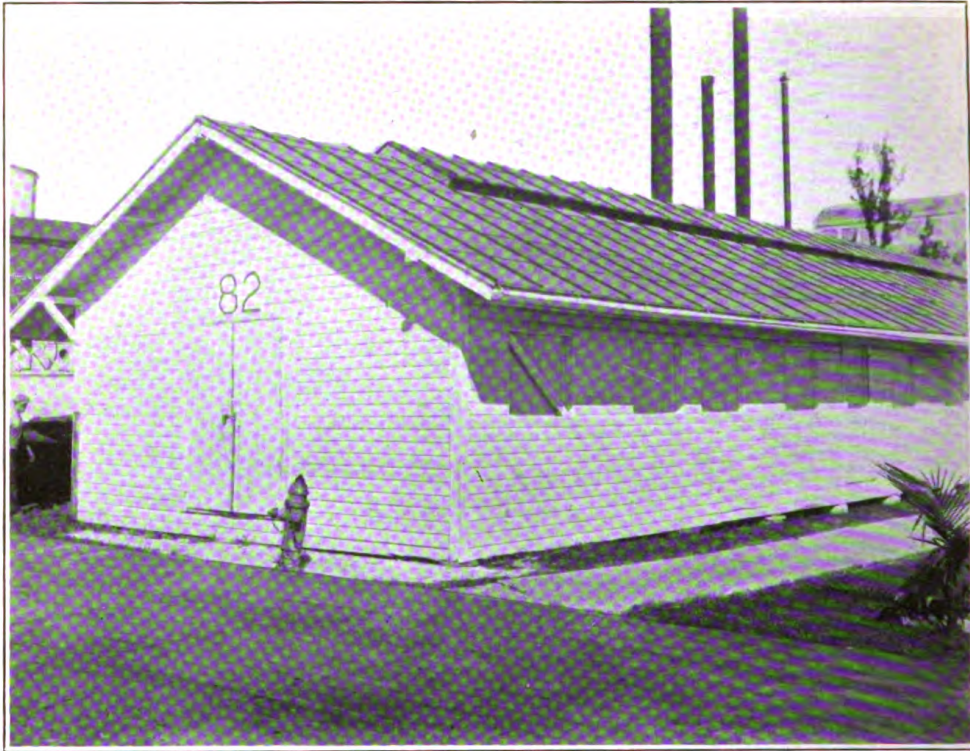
Frame building with board flooring, resting on wooden blocks within a few inches of ground. Buildings of this type were treated as shown in Fig. 6.
